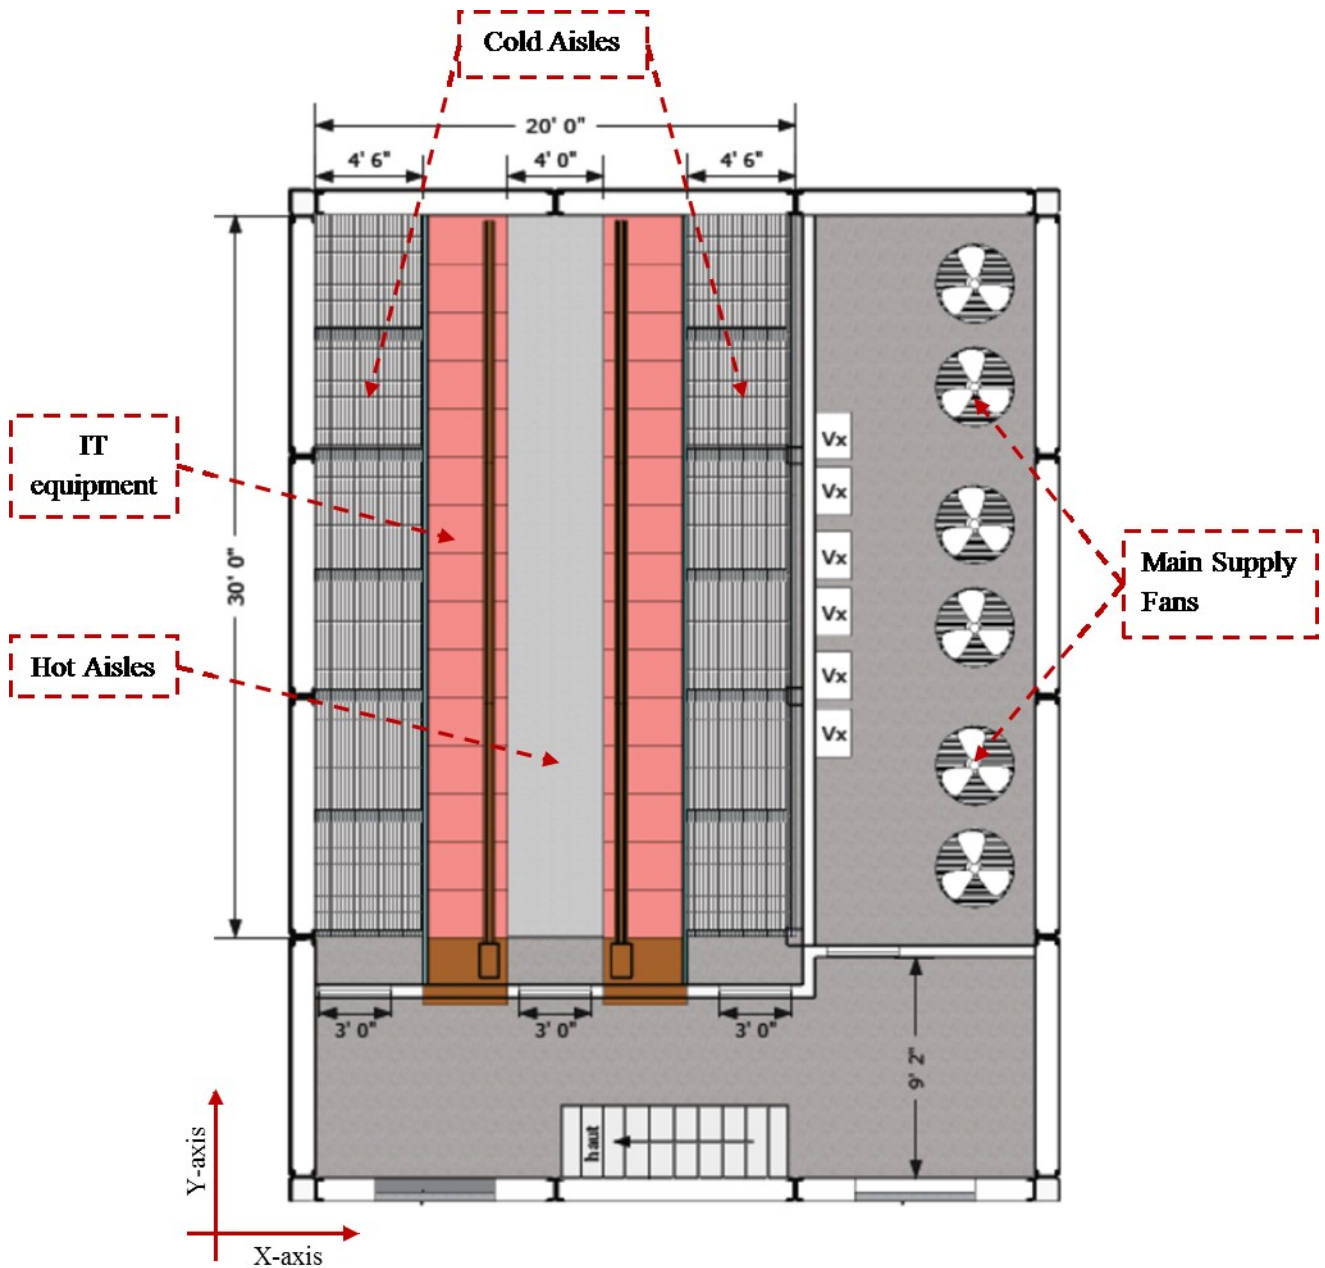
Floor Plan View of Second Floor (Vert.com Inc.)
